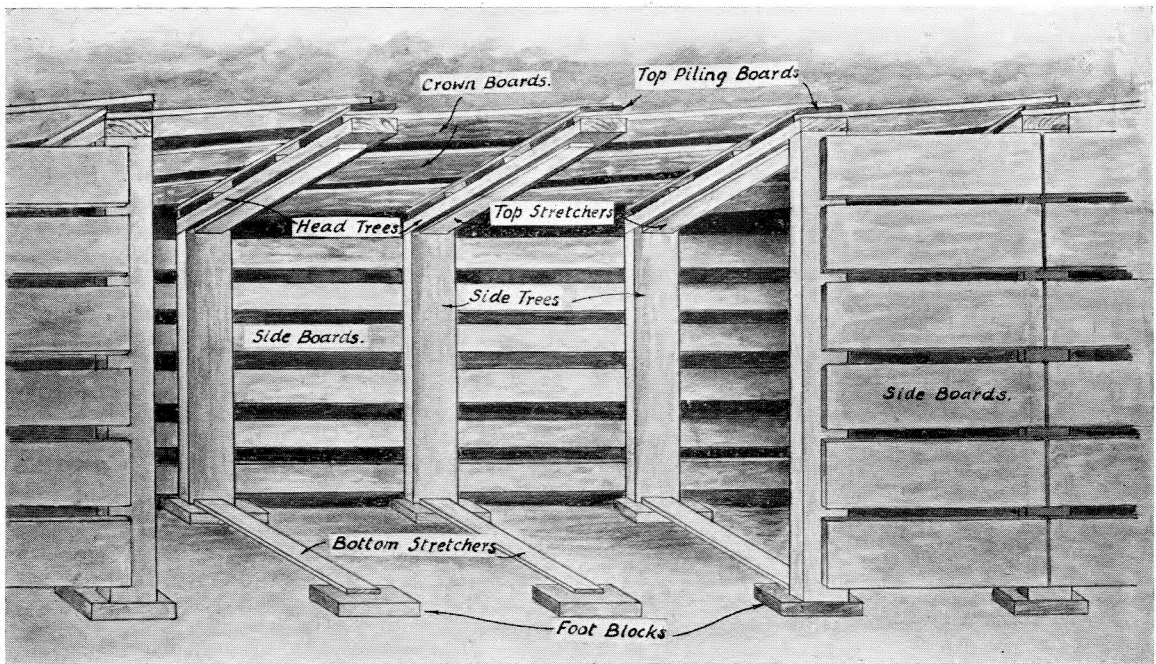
PICTORIAL DIAGRAM SHOWING TUNNEL TIMBERING IN FIRM GROUND.
